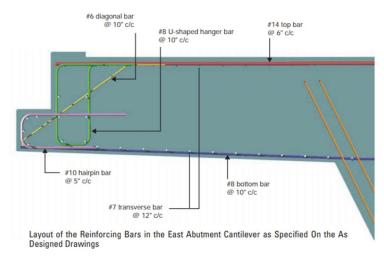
Layout of the Reinforcing Bars in the East Abutment Cantilever
